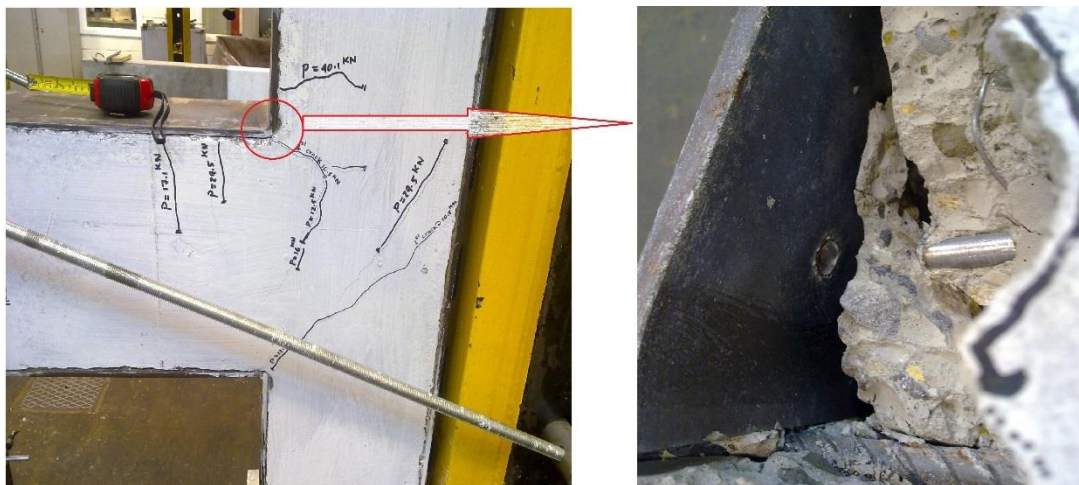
Welded stud failure in the SCS joint with normal steel
